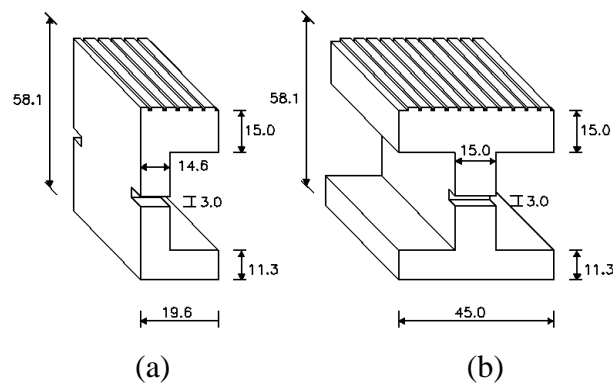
HPV Units: Specimens for (a) brick shell and (b) brick web. Dimensions in mm
